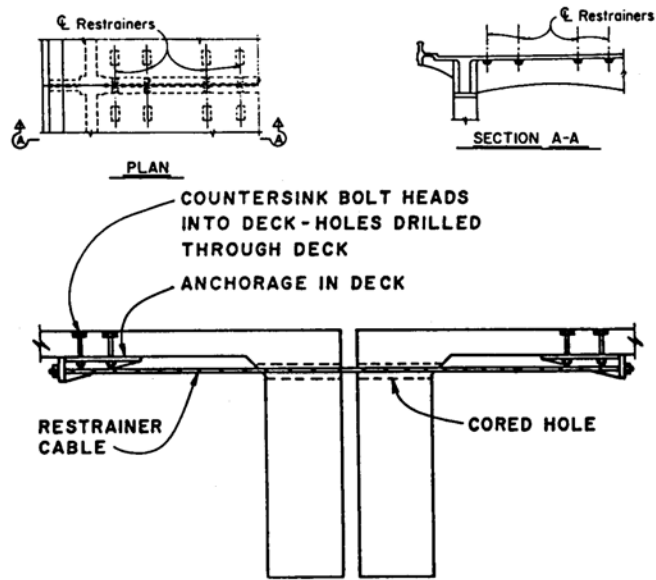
Expansion Joint Restrainer
